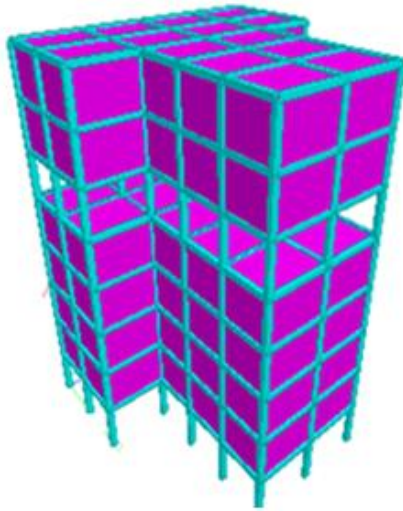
Three dimensional view of G+6 Building with fourth floor as soft storey
